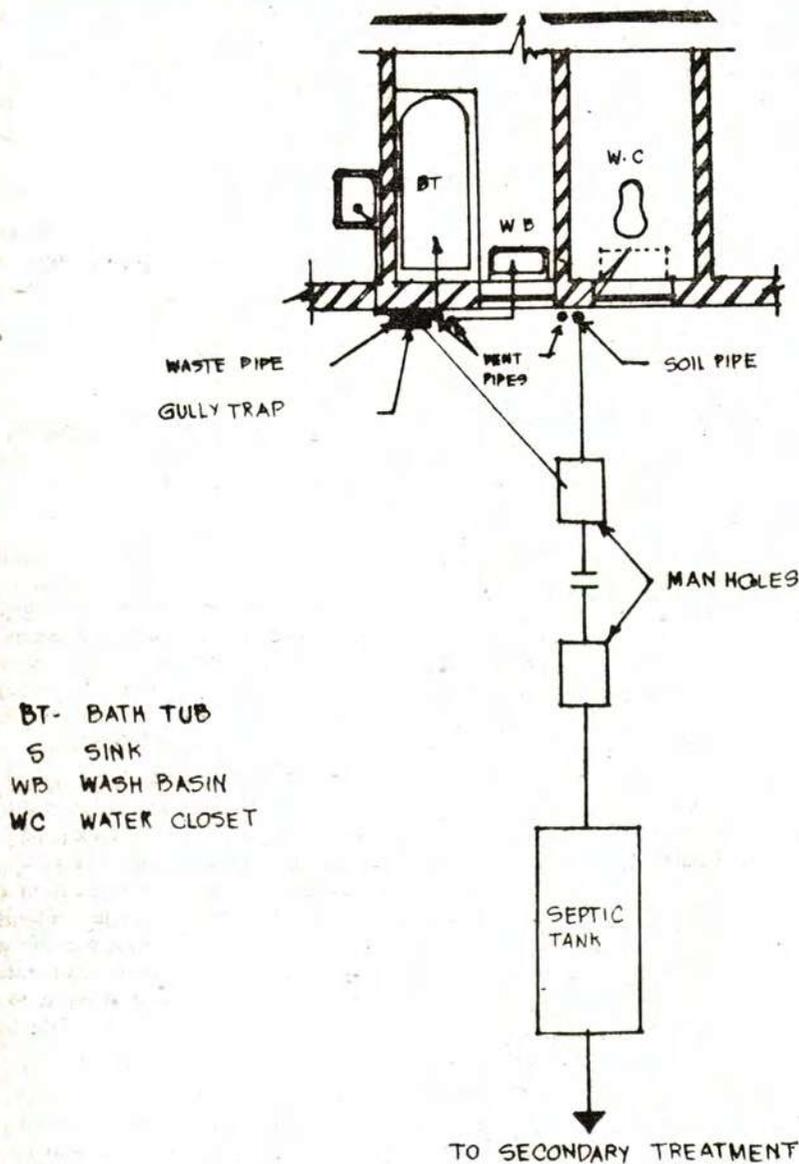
TYPICAL LAYOUT OF A SEPTIC TANK SEWERAGE SYSTEM.
